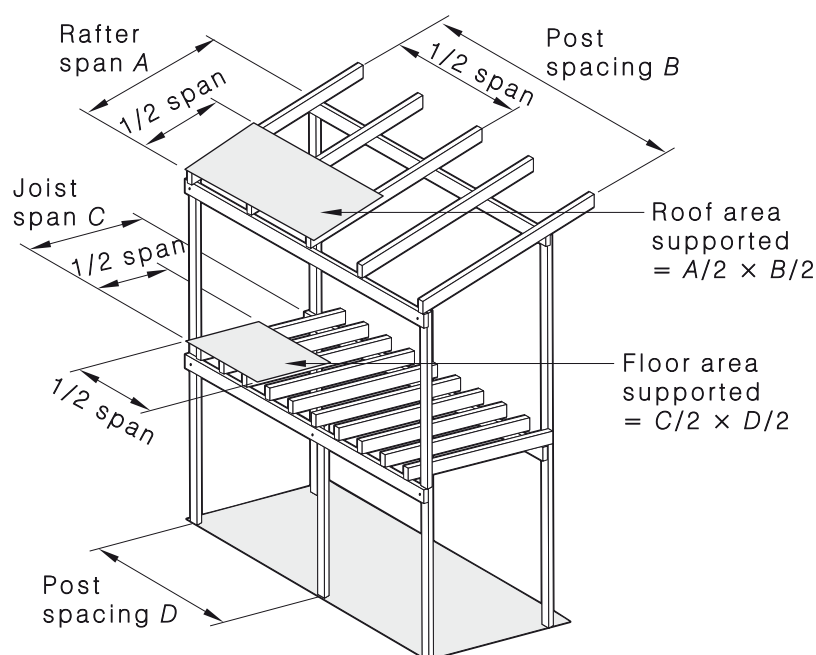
ROOF LOAD WIDTH (RLW) COMBINATIONS AND ADDITIONS
